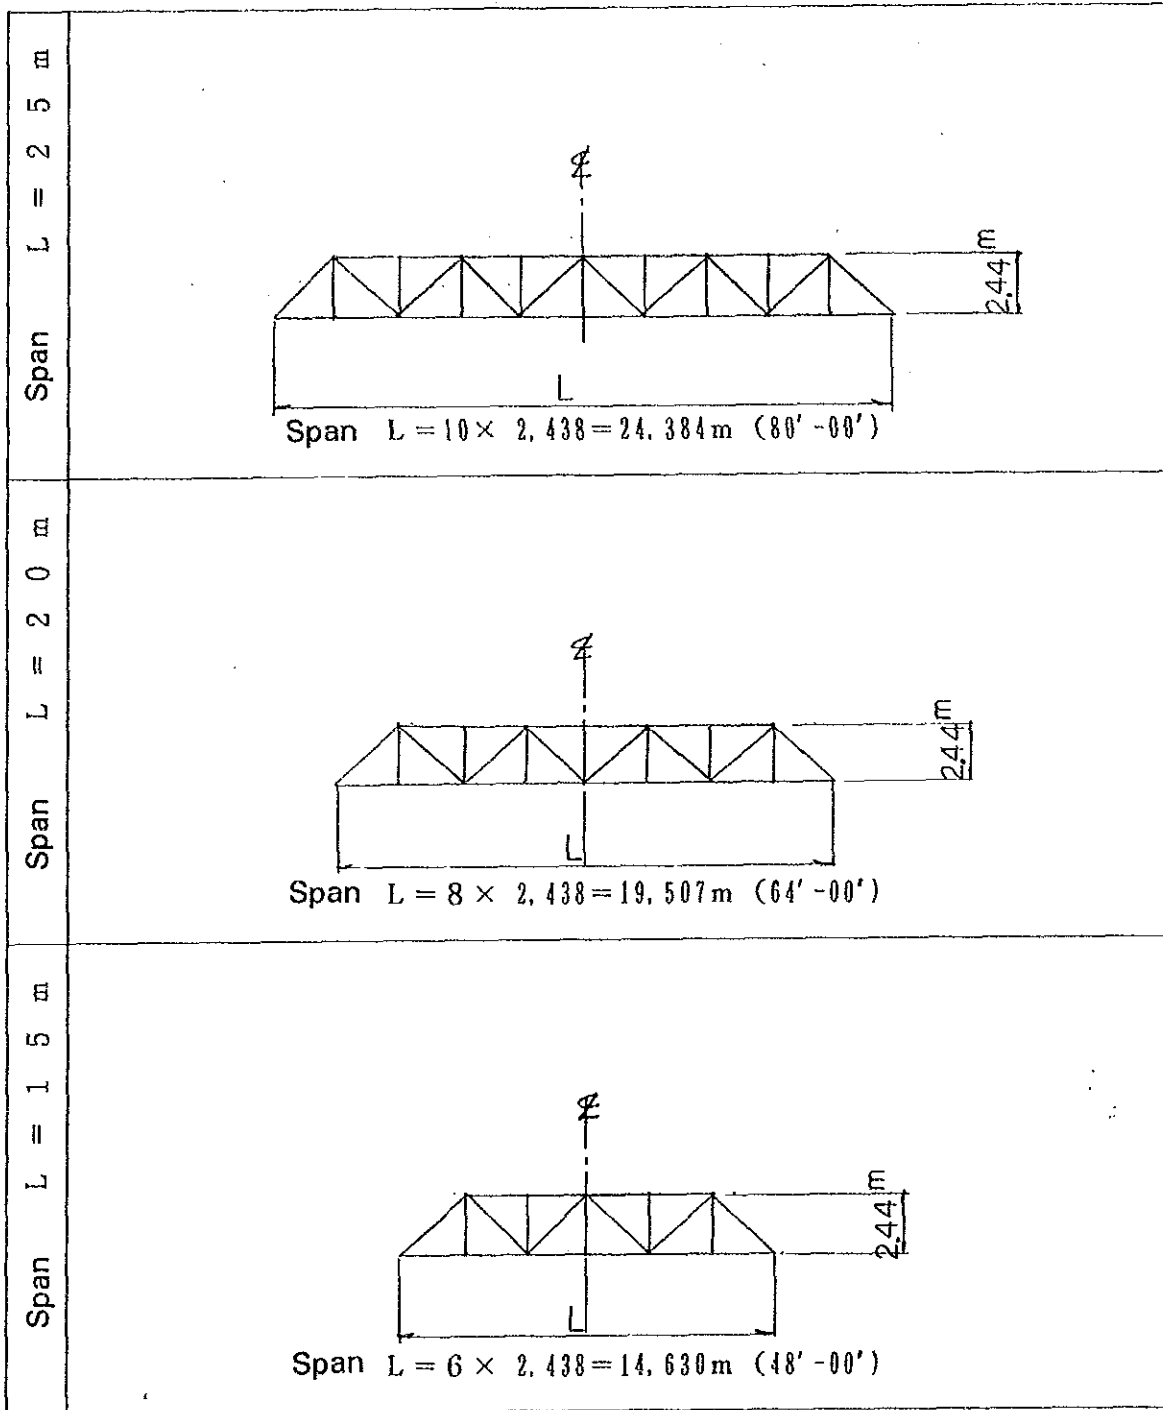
SPAN TYPE OF PORTABLE STEEL BRIDGE
